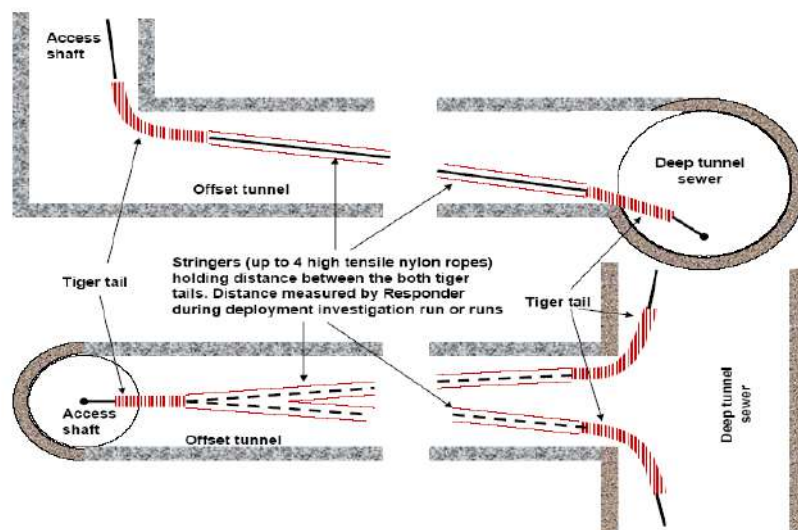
Plan & Elevation View Showing Deployment of “Tiger Tails”
